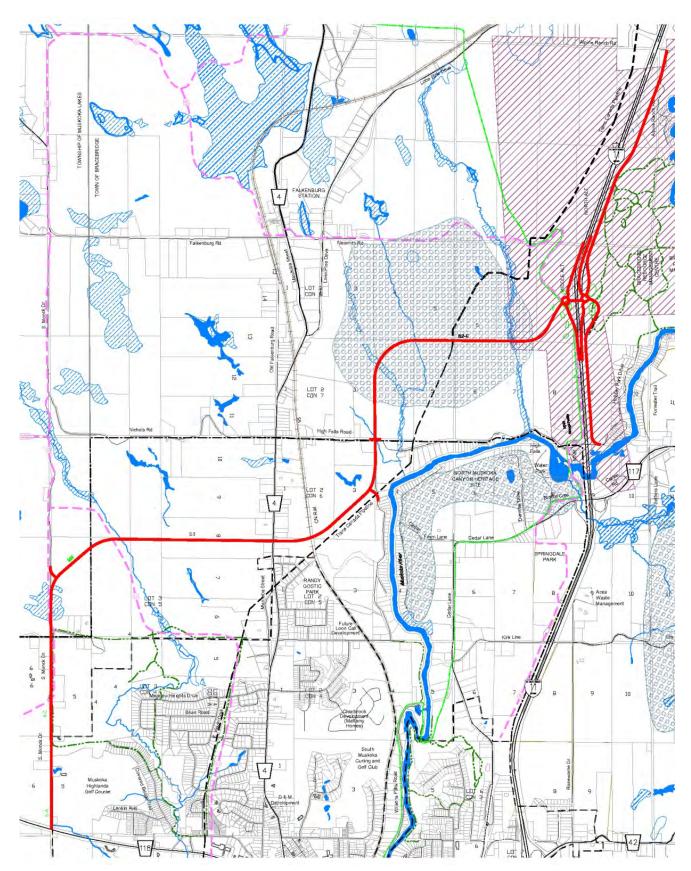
Recommended Plan – Bracebridge North Transportation Corridor
